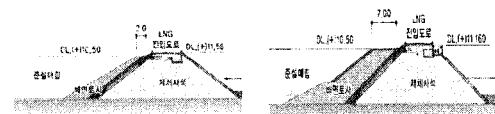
Revetment reinforcement of LNG access road (original vs alternative)
